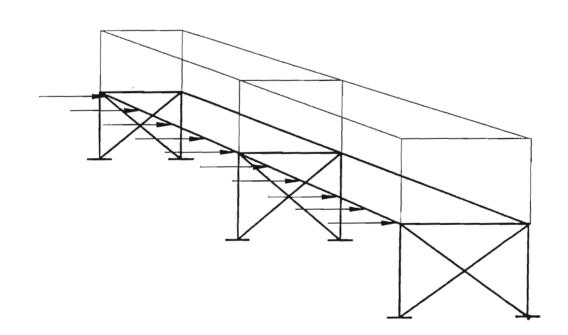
Horizontal floor diaphragm and braced frames.
